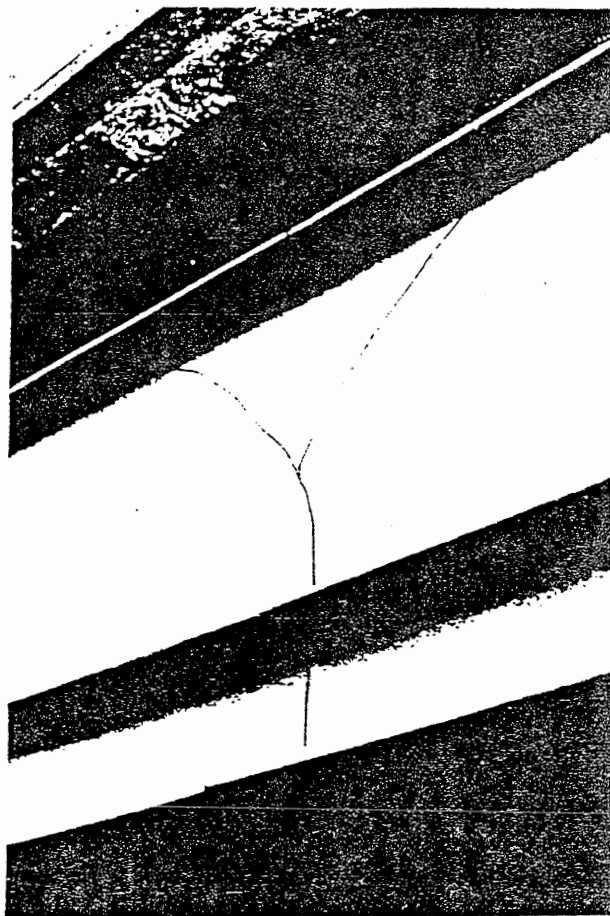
Fatigue crack initiated at stiffener butt weld joint in a composite bridge girder.
